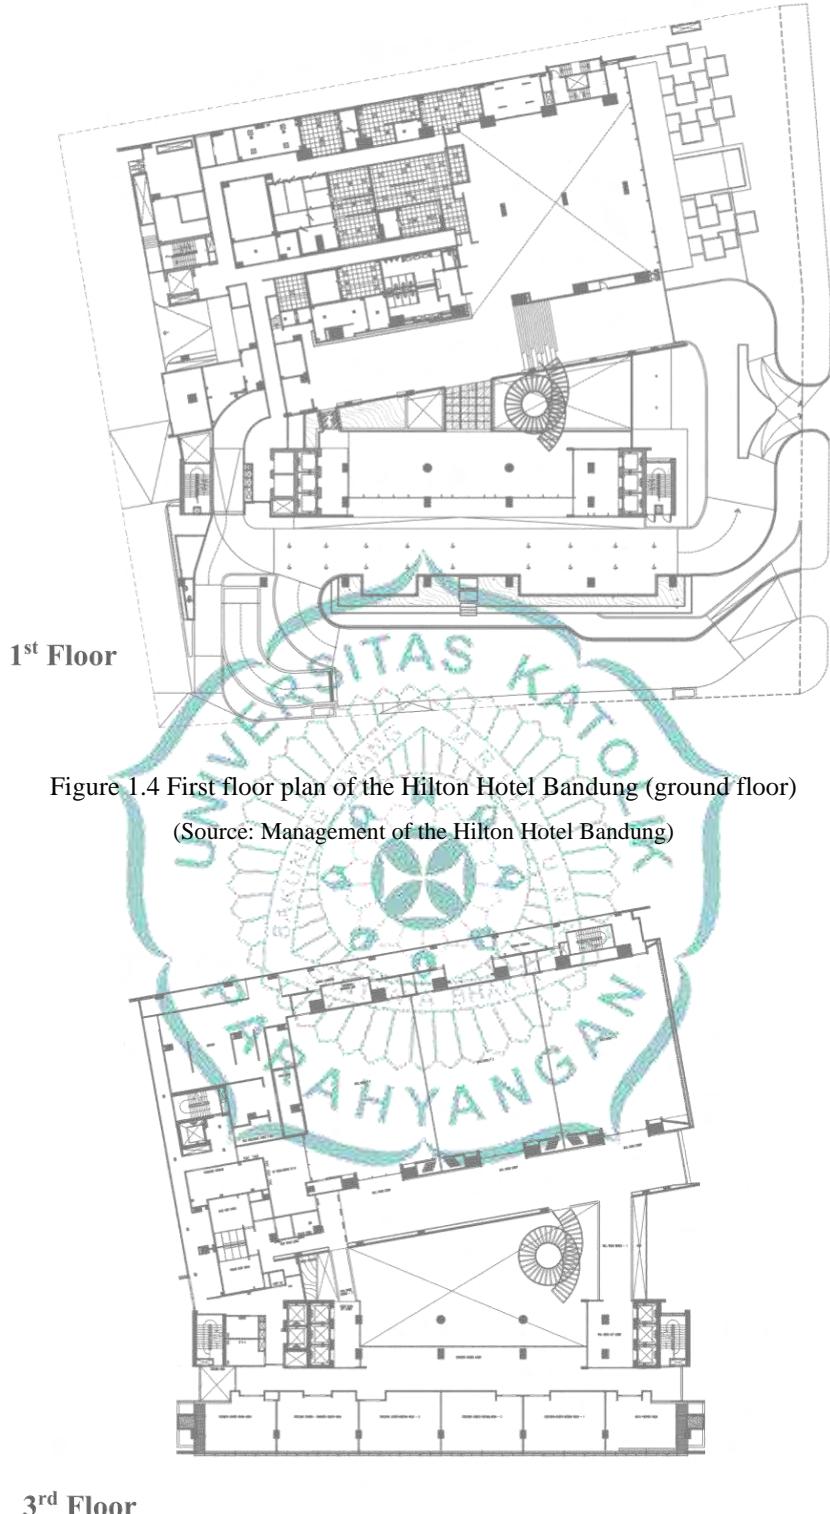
First floor plan of the Hilton Hotel Bandung (ground floor)
